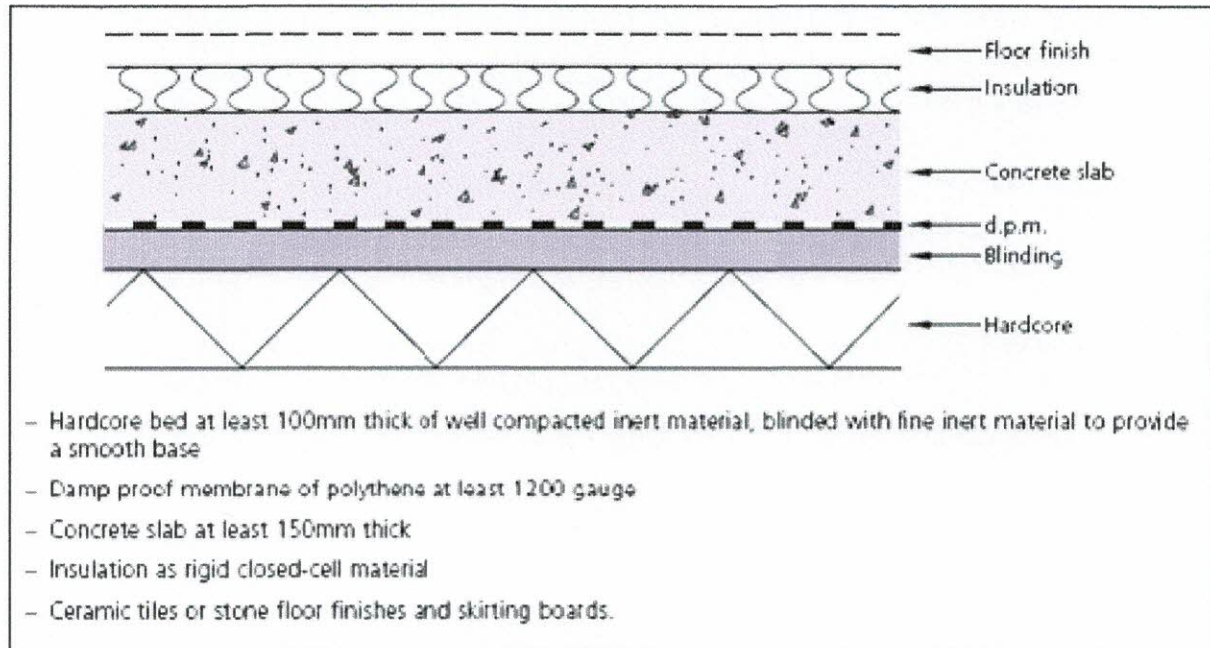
Ground-supported floor (Source: DCLG, 2007)
